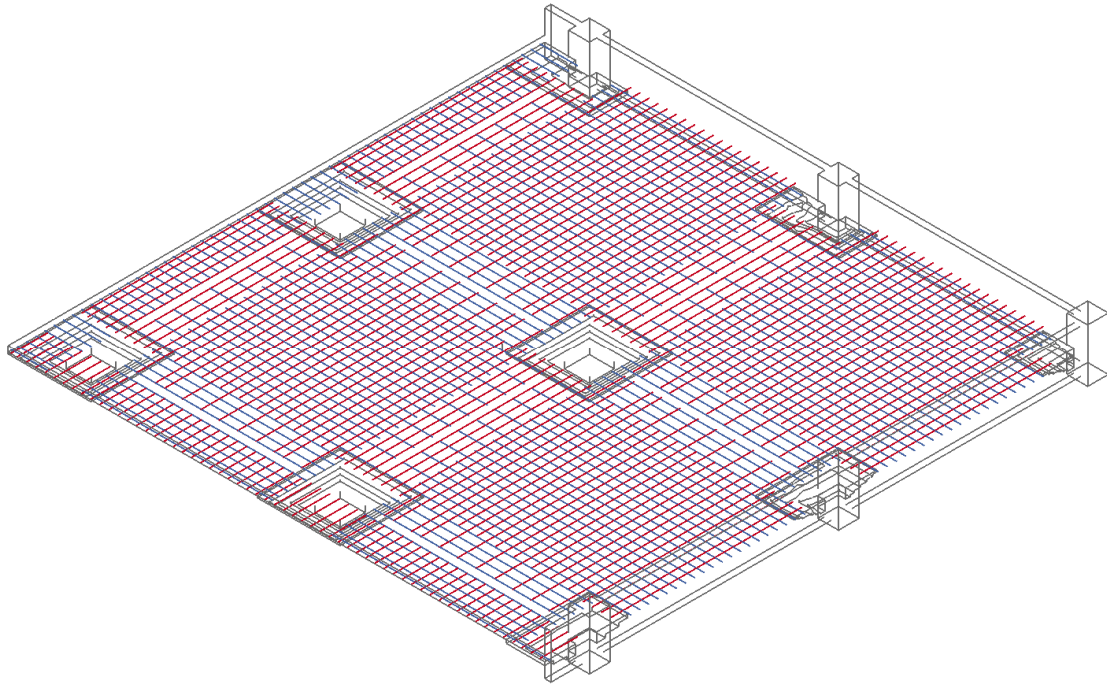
Isometric view of the slab bottom rebar mat in two directions. Note: an outline of the concrete model is shown in grey. Elastic columns are not shown.
